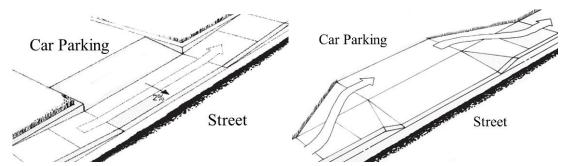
Accessible Driveway Crossing (Kirschbaum, et al., 2001, p. 5-4 & 5-5).
